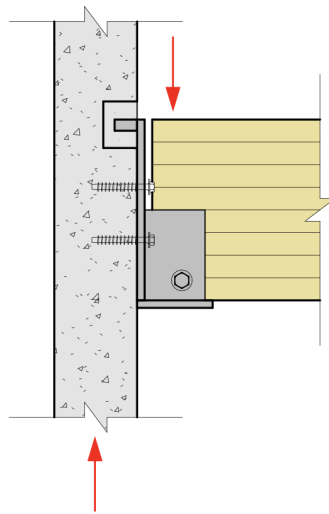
Beam perpendicular to wall connected to face of wall with top bearing. Taken from WoodWorks (2021)
